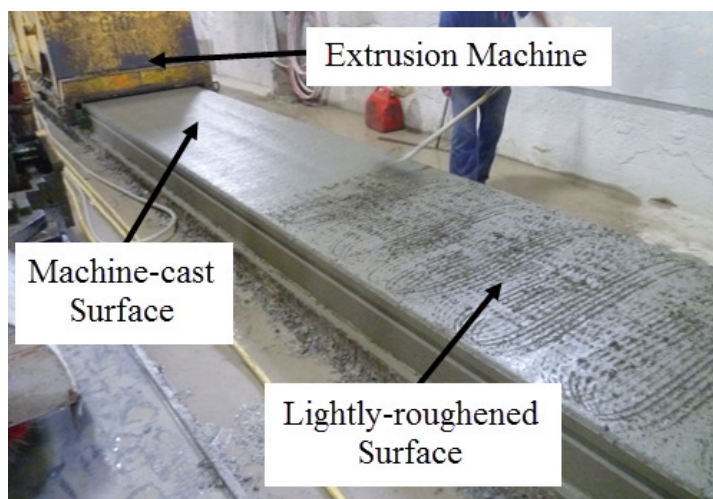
Machine-cast versus lightly-roughened surface finish.
